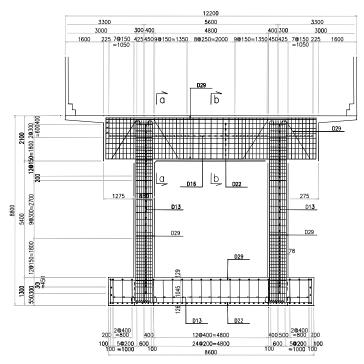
Details of the end frame of Dai-san Otagi Bridge
